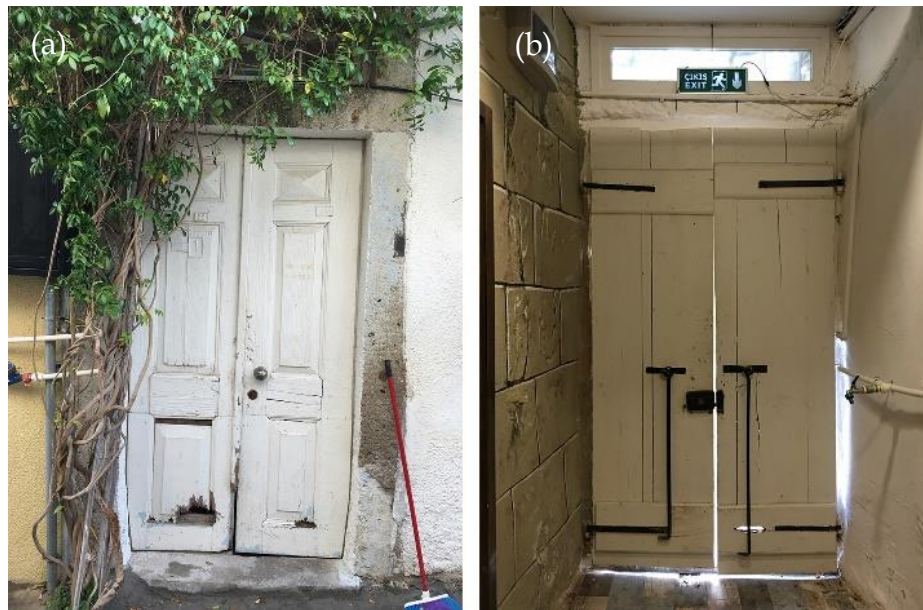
Original wooden door in the entrance hall (a) front, (b) the back
